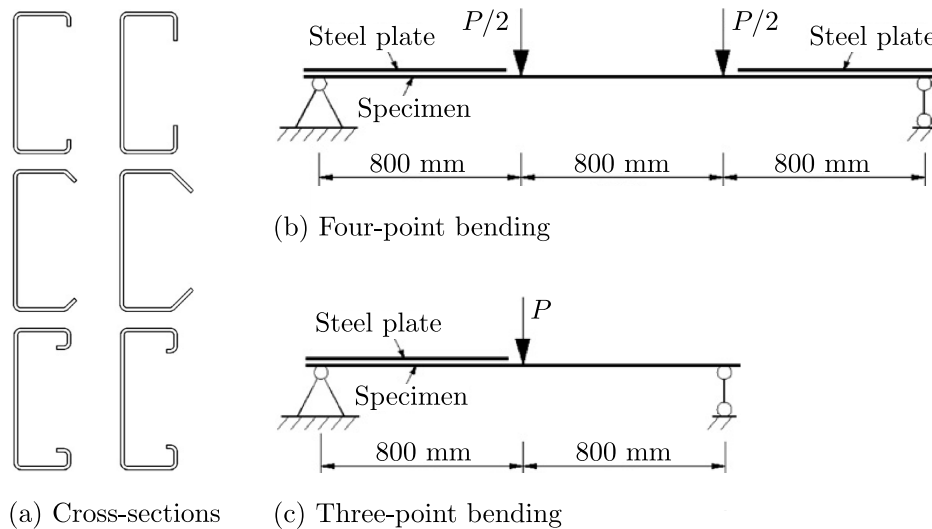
(a) Cross-sectional geometry and (b)–(c) loading configurations of the tests conducted by Wang and Zhang (2009).
